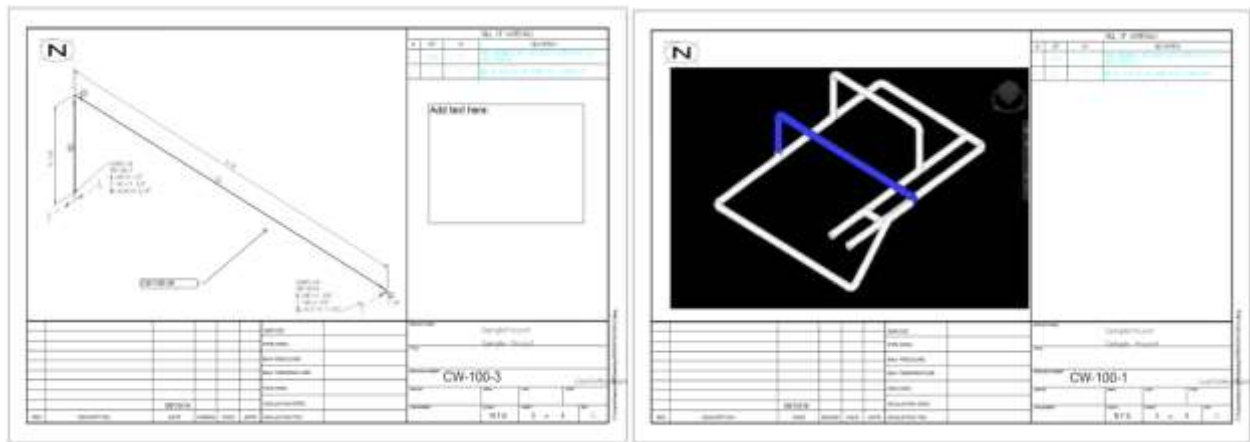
Two-Sided Isometric Drawing – Spool 4
